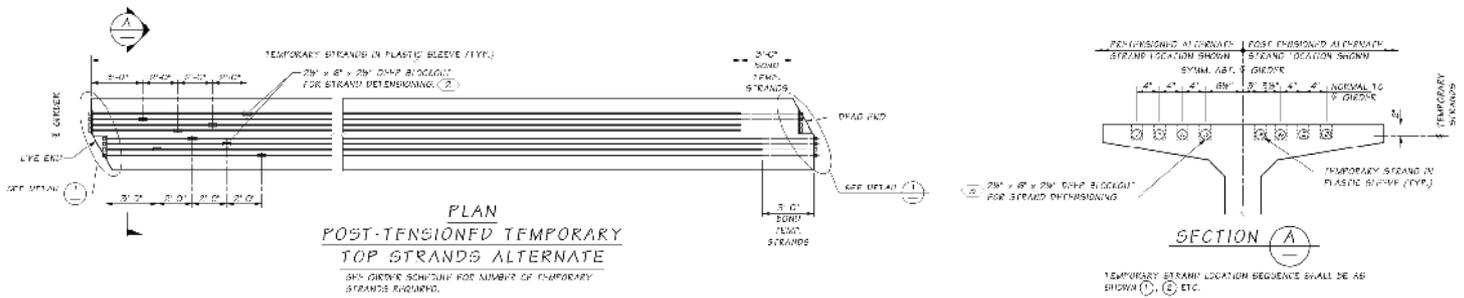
Excerpt from Washington State Department of Transportation standard details for pretensioned and post-tensioned temporary top strands. All Figures: Washington State Department of Transportation.
